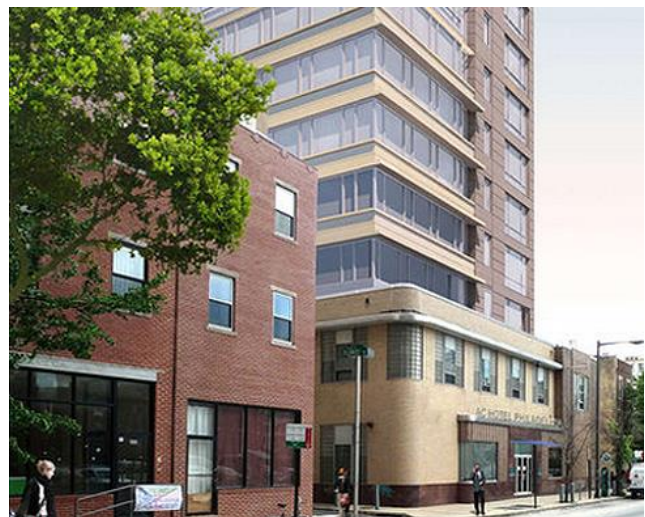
Rendering showing new hotel on top of existing, two-story building. (Courtesy Google Maps)
